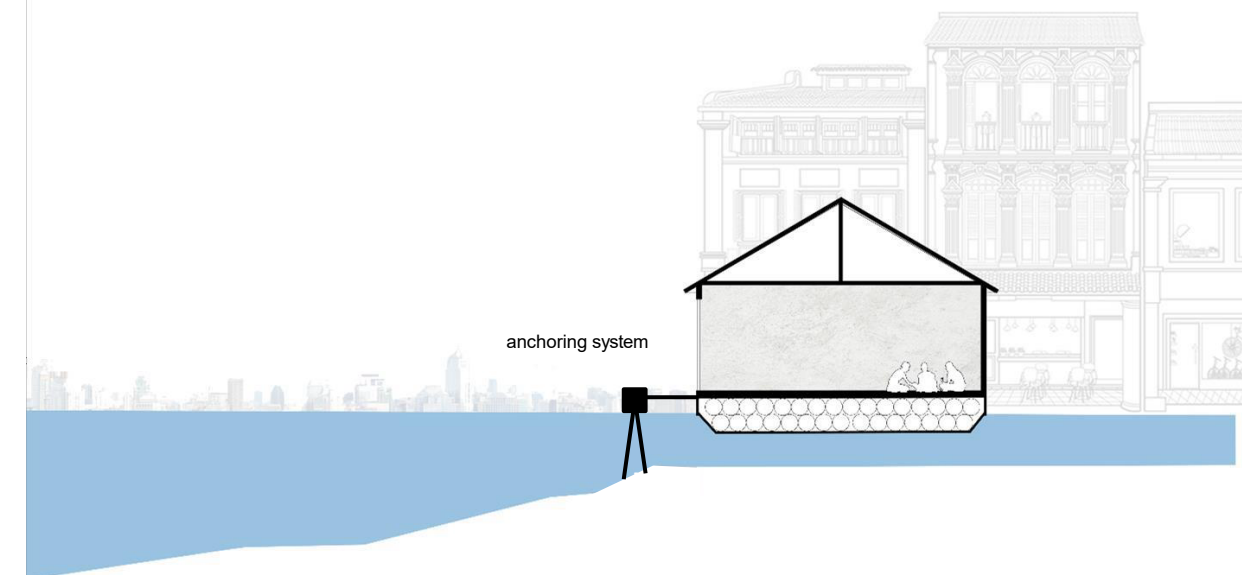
Replacing foundation system with pontoon structure to adapt with flooding
